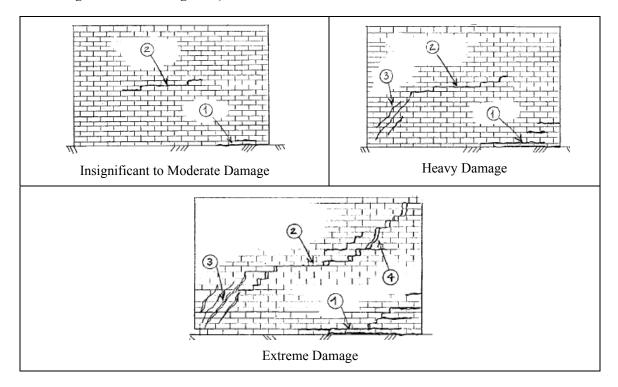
Illustrations on in-plane flexural failure of masonry wall (Flexural Cracking/Toe Crushing)
